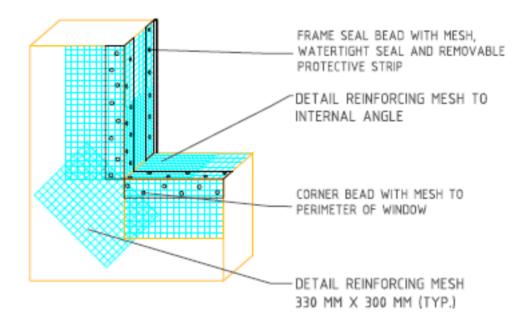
Detailing of mesh around openings (shown with optional corner beads)
